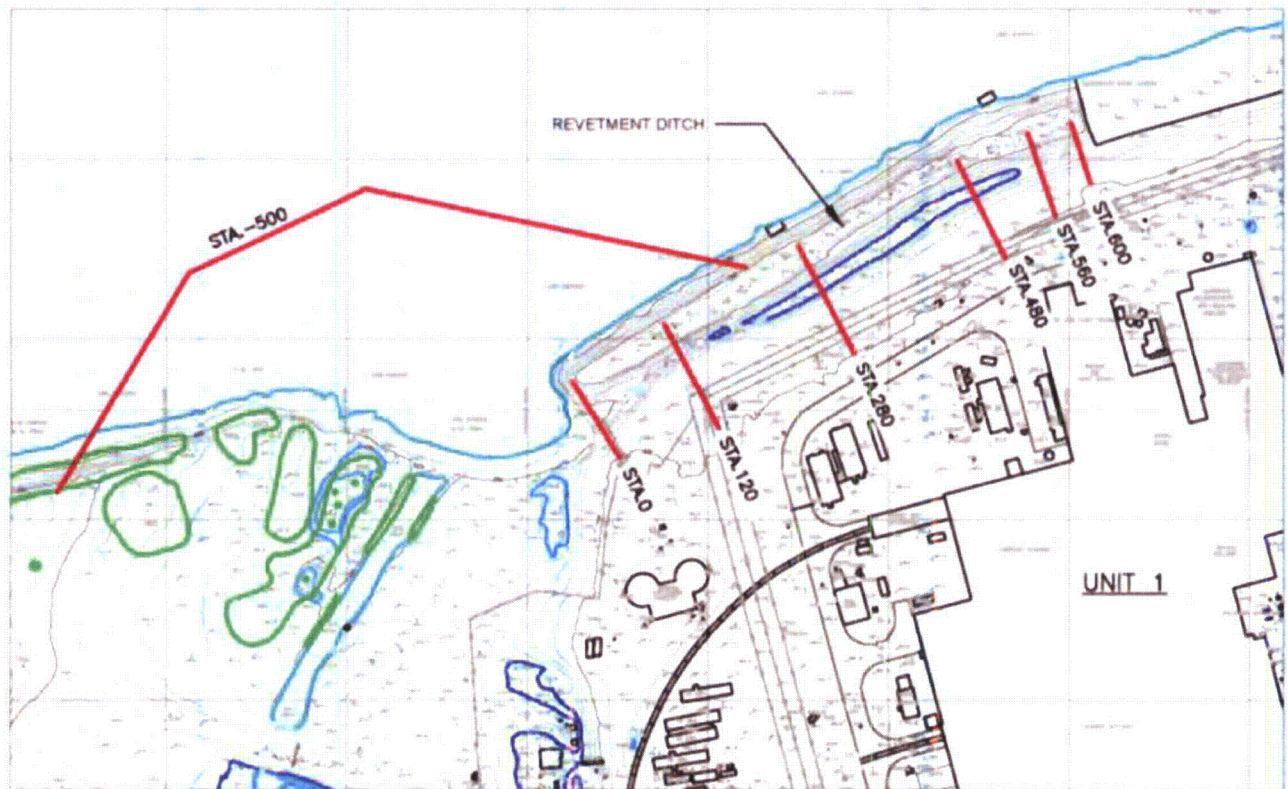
HEC-RAS Cross Section Locations along Unit 1 Dike Drainage Ditch
